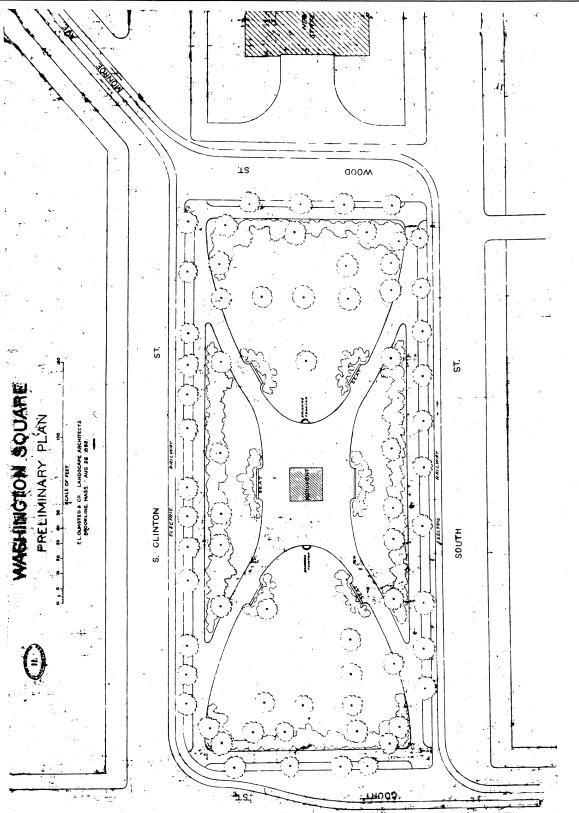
Preliminary Plan of Washington Square, F.L. Olmsted & Co. Landscape Architects, August 26, 1892. Courtesy collection of the Frederick Law Olmsted National Historic Site.
